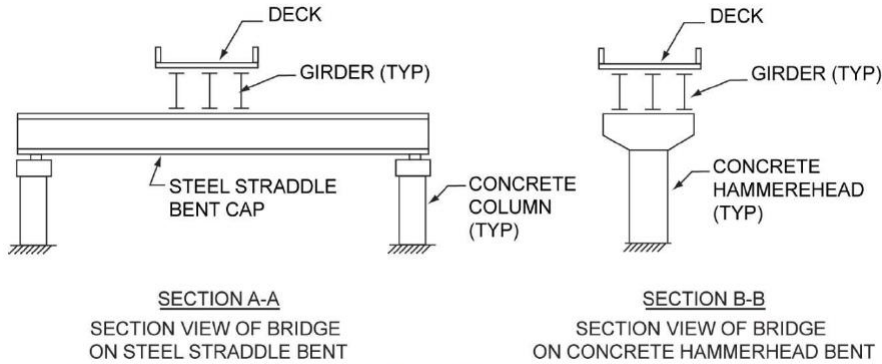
Girders supported by a steel straddle bent cap versus girders supported by a concrete hammerhead
